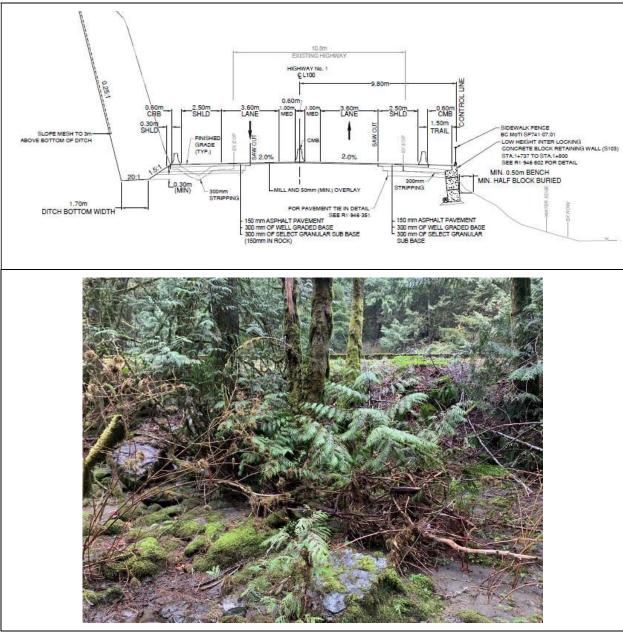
100% Detailed Design Drawings of the Retaining Wall at the Southern End of the Project (top). View of the riparian area and the edge of the stream channel at the retaining wall location (bottom).
